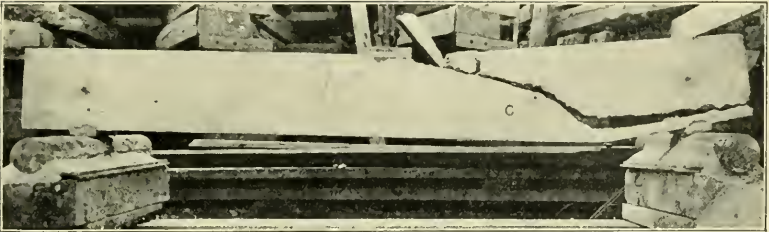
BEAM TESTED FOR BOSTON TUNNEL, WITHOUT STIRRUPS, SHOWING TYPE OF FAILURE.
